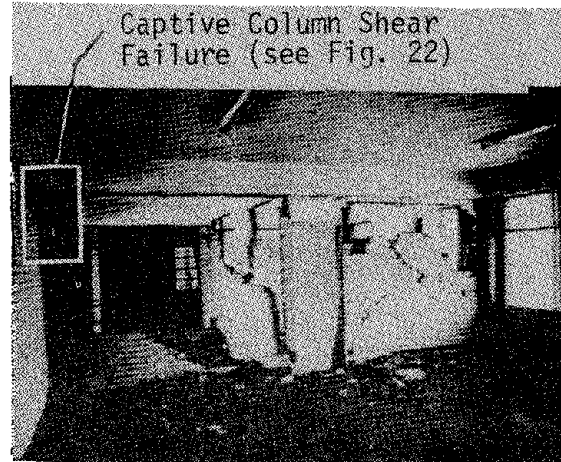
WALL DAMAGE AT TRANSVERSE FRAME
